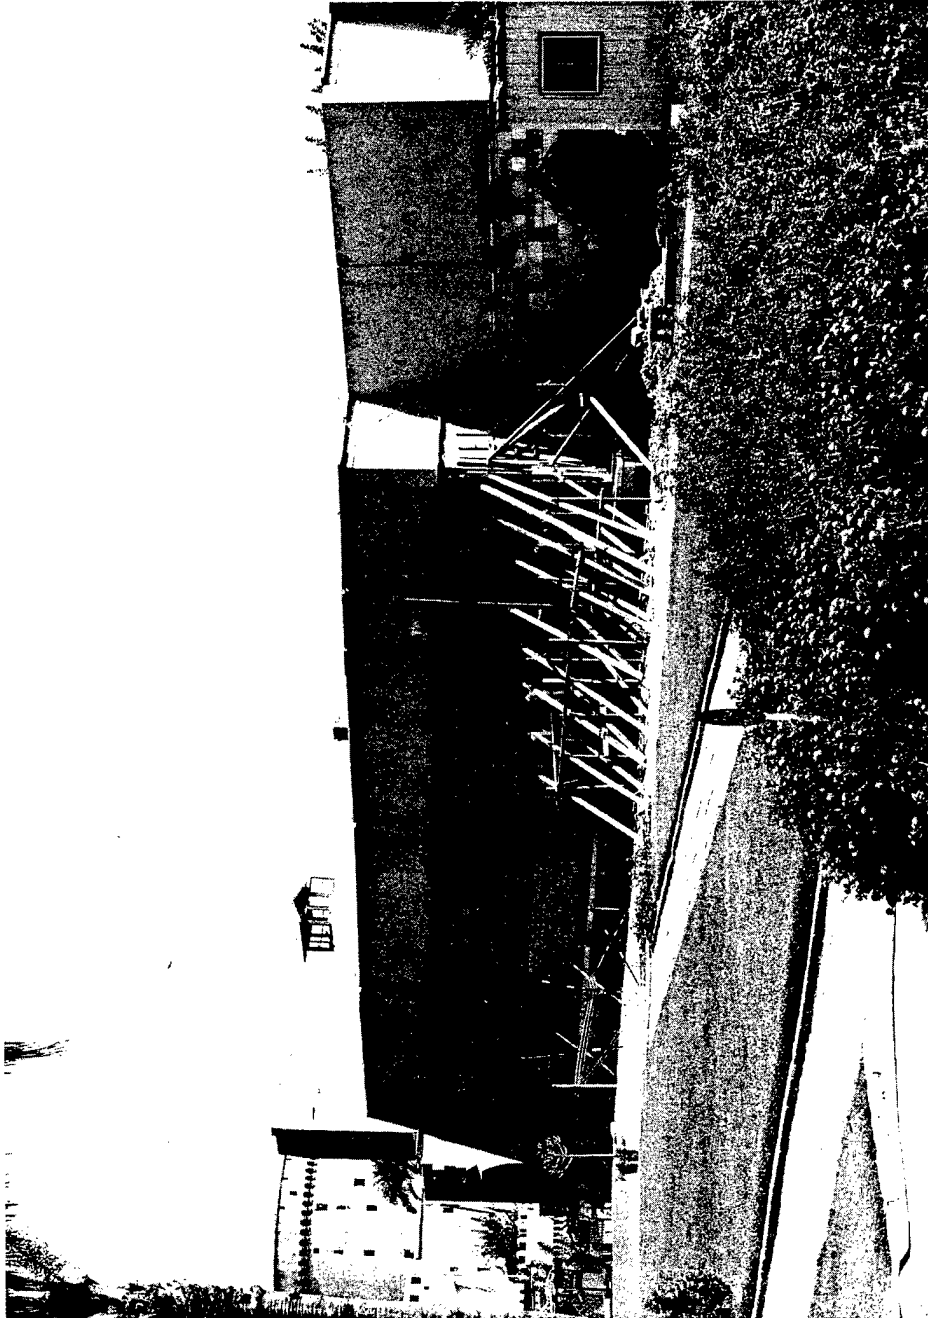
Collapsed southwest corner of Mint at Citadel showing large crack and separation and external bracing
